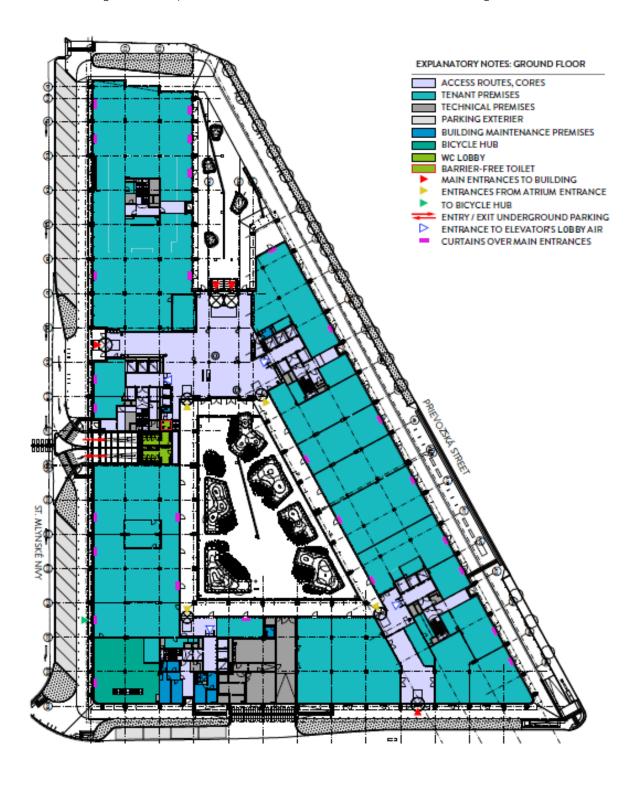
Floor plan of the 1st floor - location of the accessible toilet (green)
